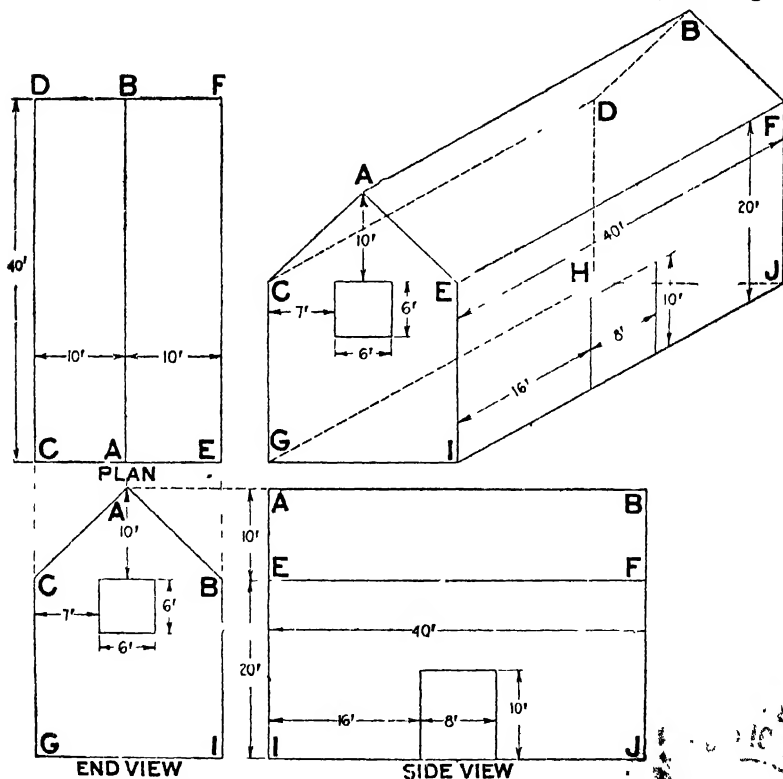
,319 to 5,322 — Cabinet projection of a prism, and orthographic views of same, being shown in plan, elevation and end view
